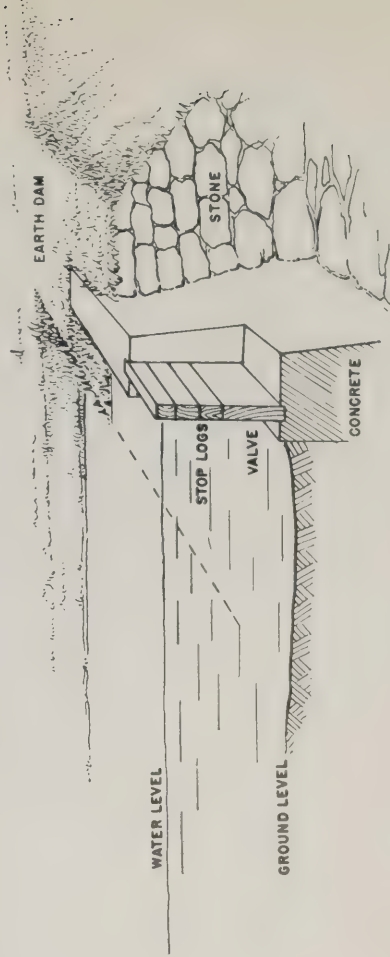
A section through the concrete structure. It should be noted that the floor of this section of the dam is level with the bottom of the pond. The concrete is set well back into the earth dam and must go deep enough into the stream bed that it will have a firm base and not allow water to leak under it and will not heave with the frost. The stop logs may be removed in anticipation of very heavy flows. If the spillway section with logs removed is as large as the stream channel which feeds the pond, no water should go over the earth structure of the dam.
